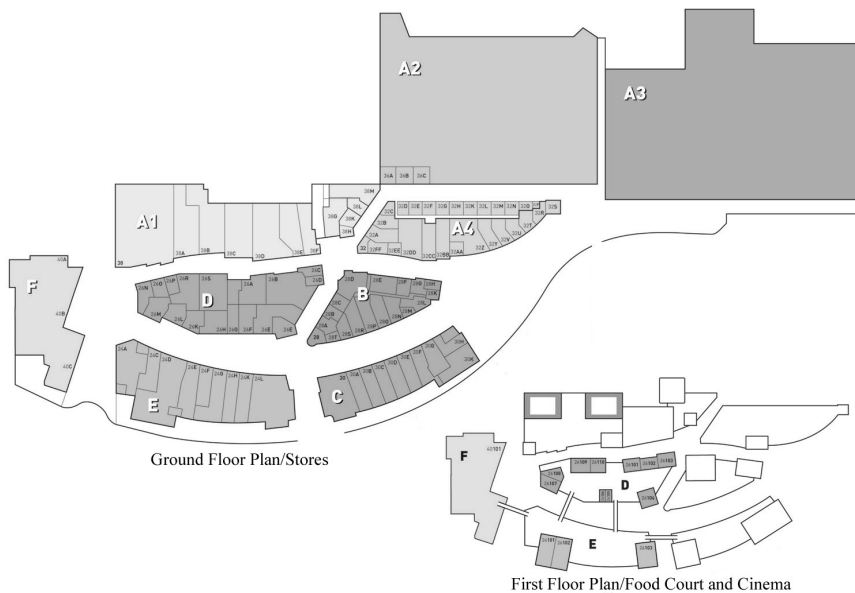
Ground and First Floor Plans of Forum Bornova Shopping Center (Source: www.forumbornova.com)
